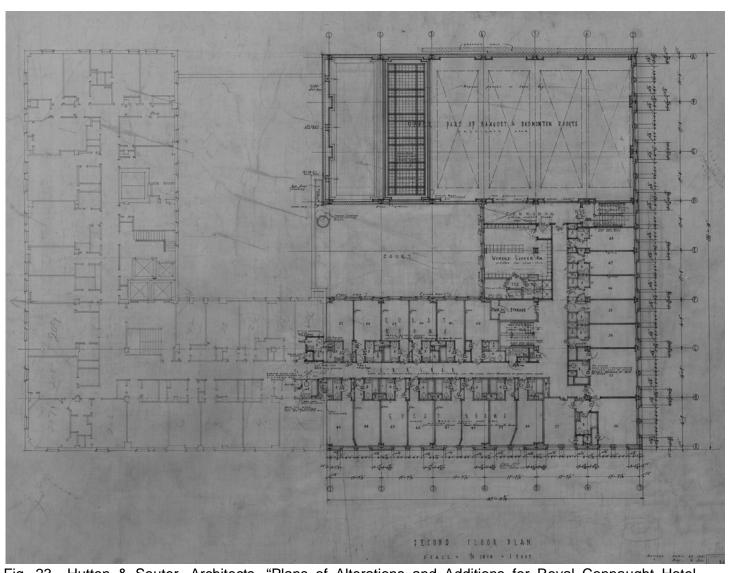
Hutton & Souter, Architects, "Plans of Alterations and Additions for Royal Connaught Hotel Hamilton," 27 Apr. 1931, Souter, Bell, Howard and Souter Fonds, Archives of Ontario, C12-1-0-458, Container # L-717, Barcode B732587, Drawing No. 4 – Second Floor Plan.
